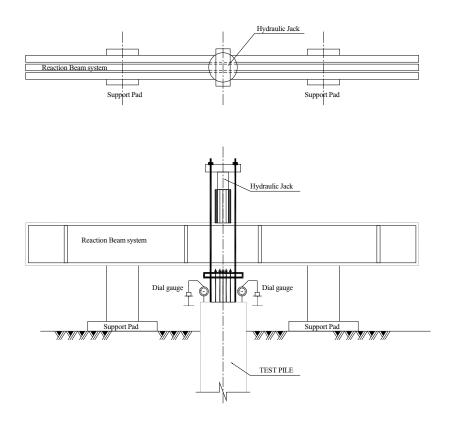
Schematic diagram of the test set-up and arrangement for site S-01
